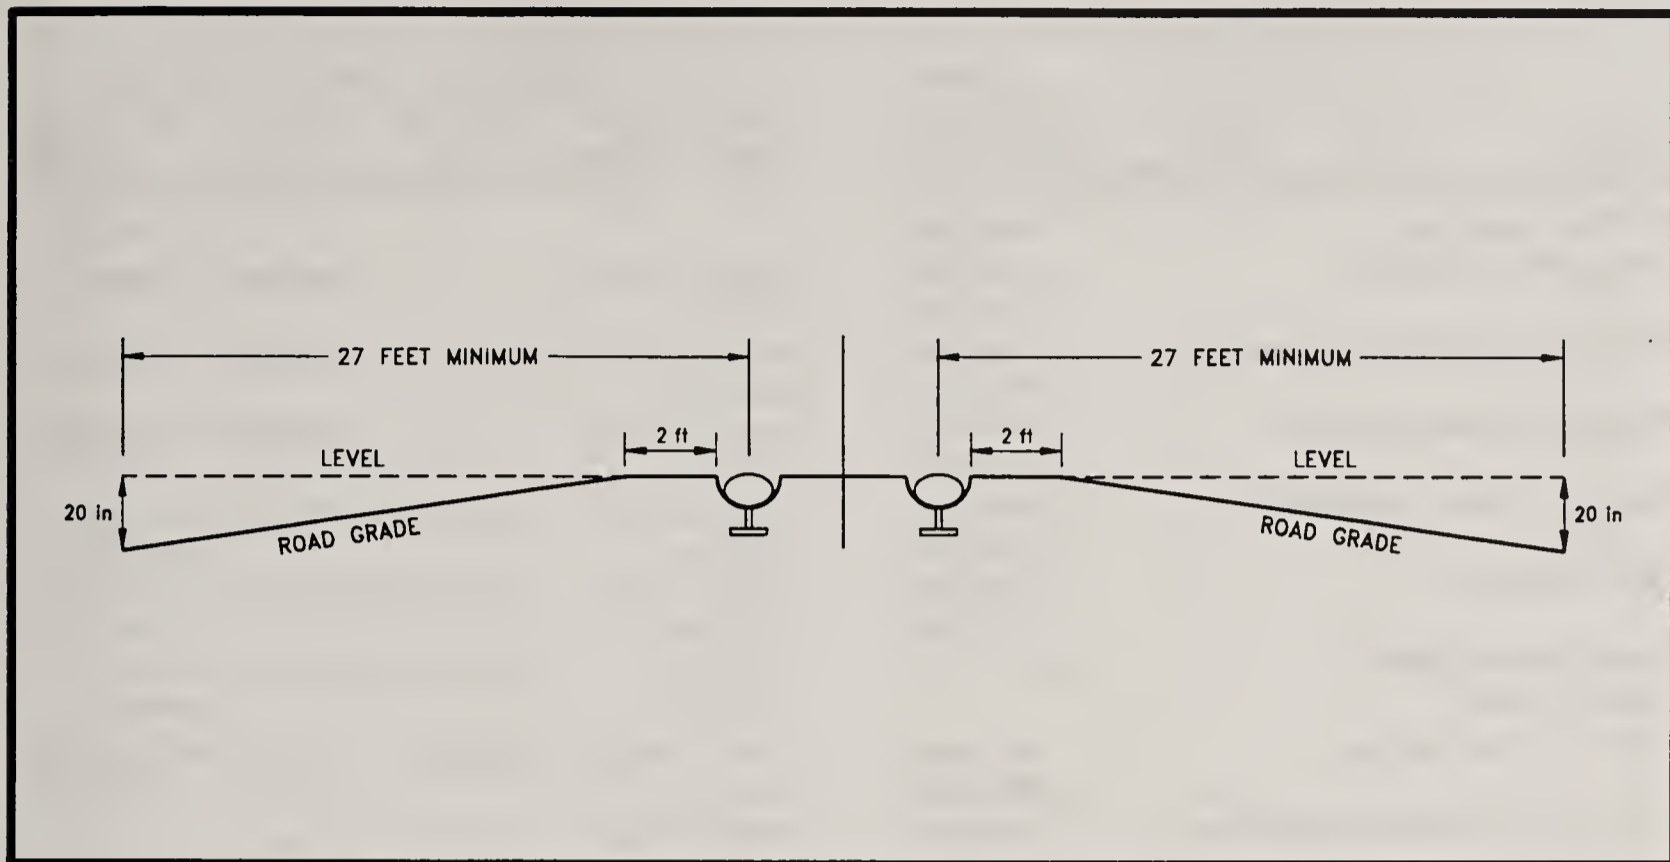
Typical At-grade Crossing of County and Local Roads.
